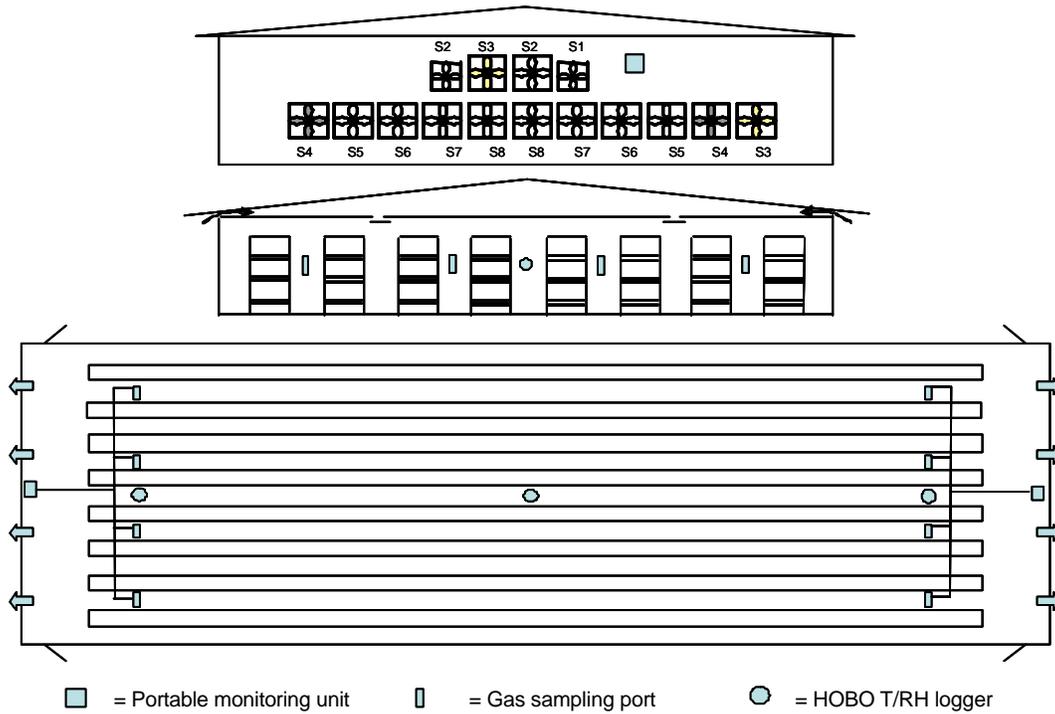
Schematic layout of the IA manure-belt layer house showing the end wall, cross-section, and floor plan of the house and the sampling locations. The exhaust fans are labeled by stages 1-8.
